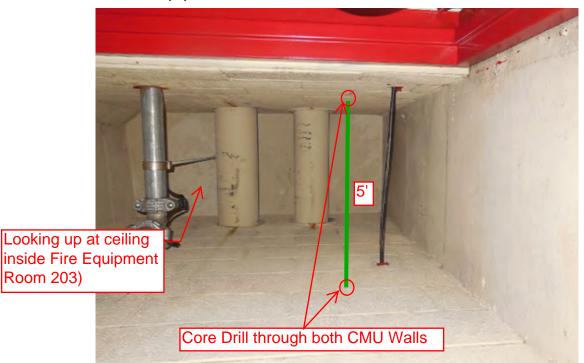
Proposed Conduit Run (Room 203 and Room 205) - looking up at ceiling inside Fire Equipment Room 203.
